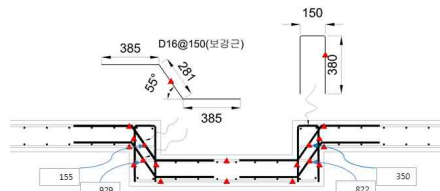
Strain of inclined rebar of specimen-8
